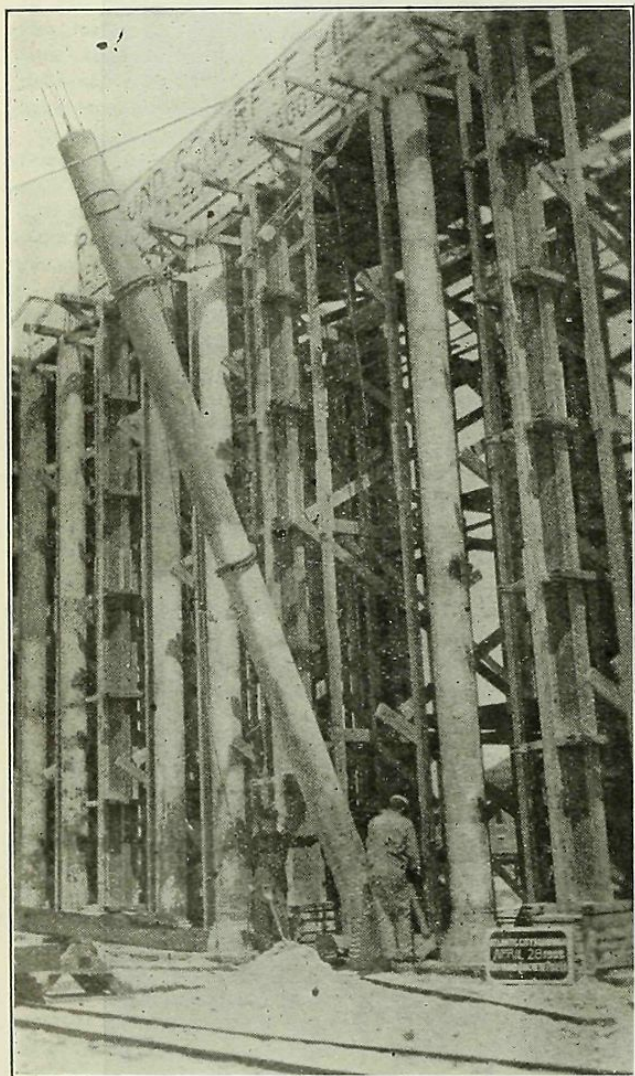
TAKING COMPLETED PILE OUT OF FORM.
